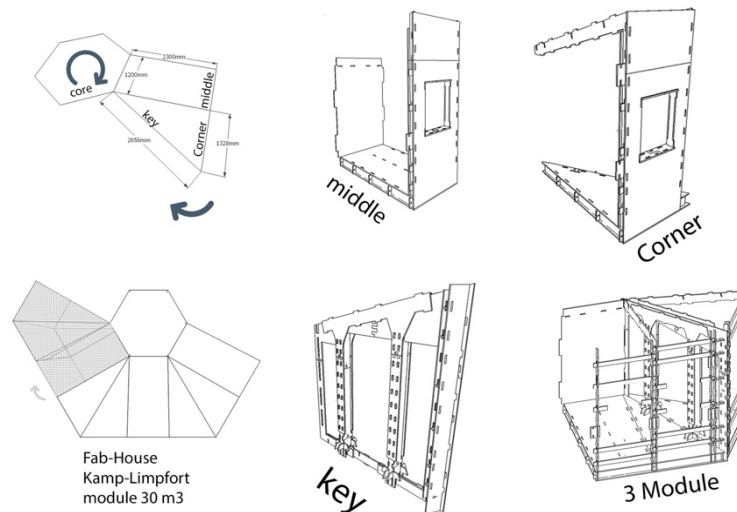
General construction of the FabHouse: dimensions, rectangular 'middle' pieces, 'caky' corner pieces, layout, key elements, setting of 3 modules (top-left to bottom-right)
